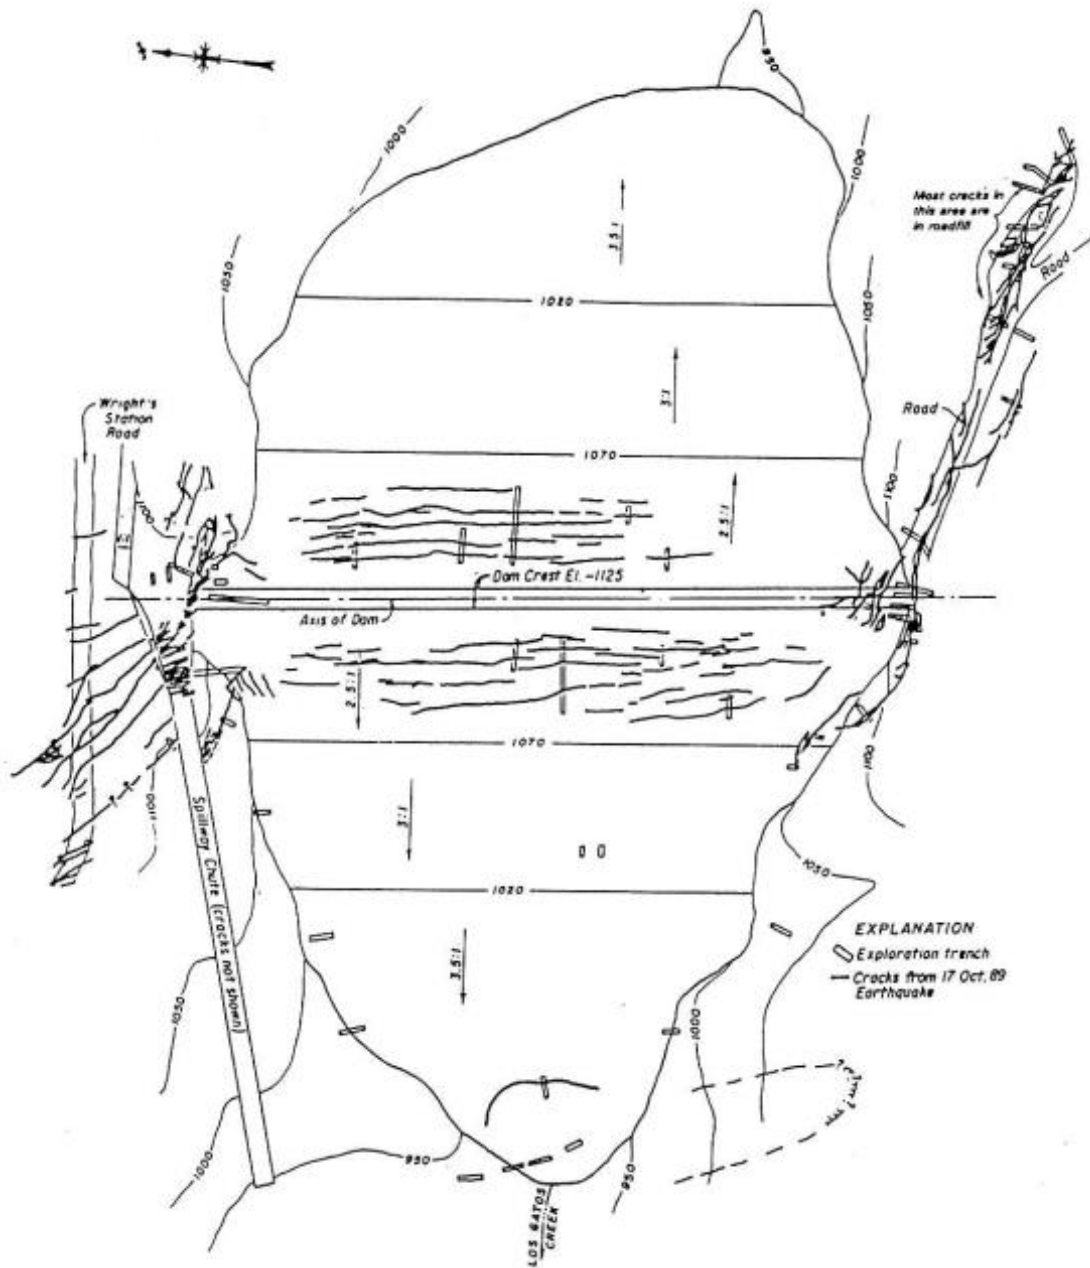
Plan of Transverse and Longitudinal Cracking at Austrian Dam (Forster and MacDonald 1998)
